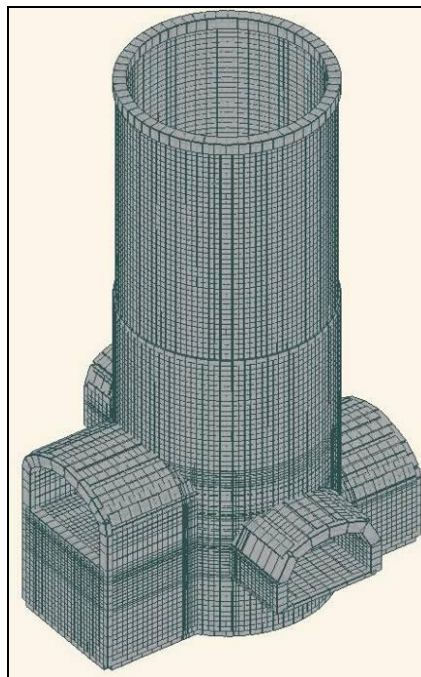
3-D GSA model for the lining wall structure below rockhead
